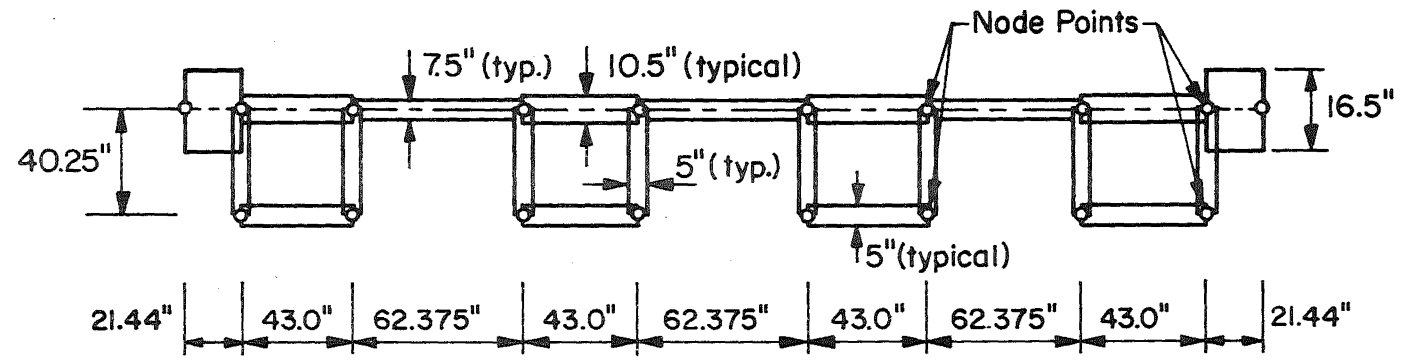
Idealization of the Cross Section - Berwick Bridge
